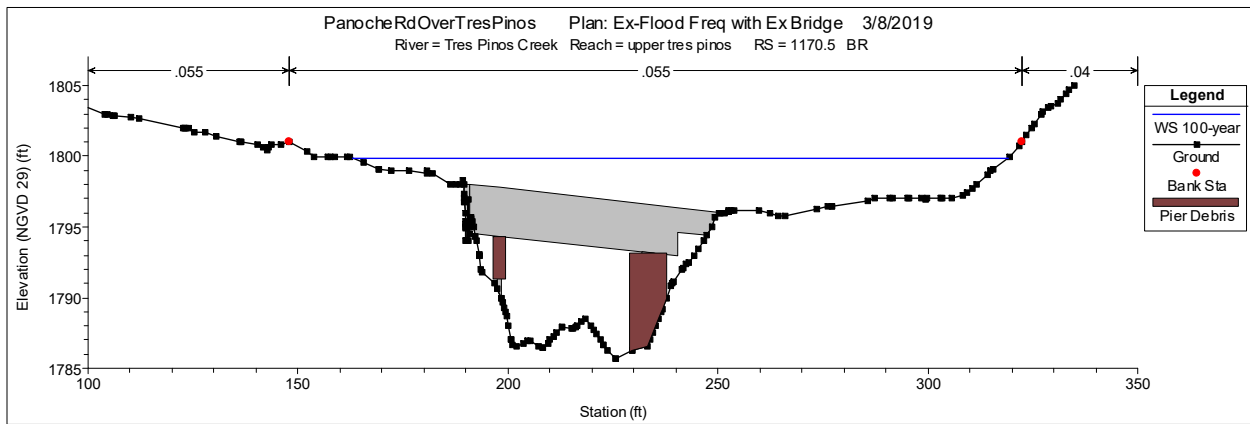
Existing Bridge Cross Section (Facing Downstream/Southwest)
